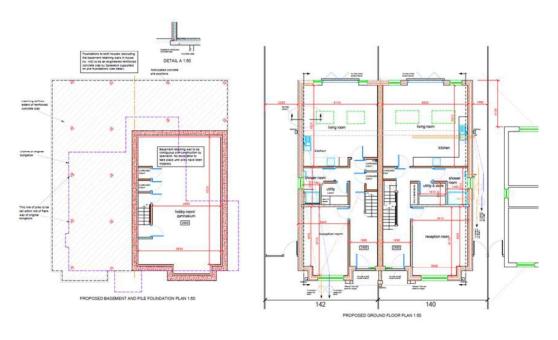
Proposed Basement and Ground Floor Plan (please note – larger version of plan can be found in the Committee Plan Pack)
